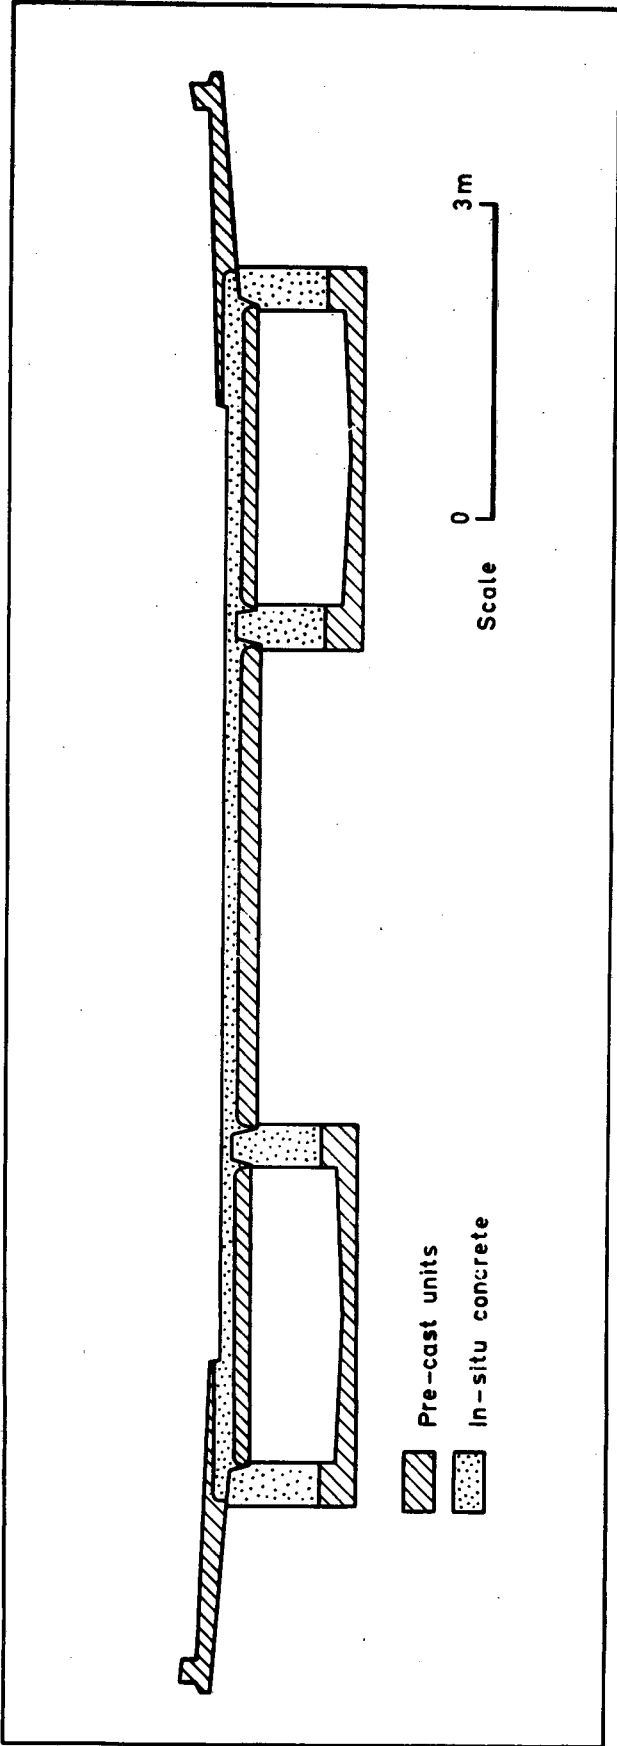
SECTION OF THE BRIDGE AT MID-SPAN
